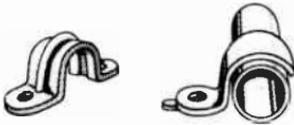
Clamps for strapping conduit to a wall or post.
